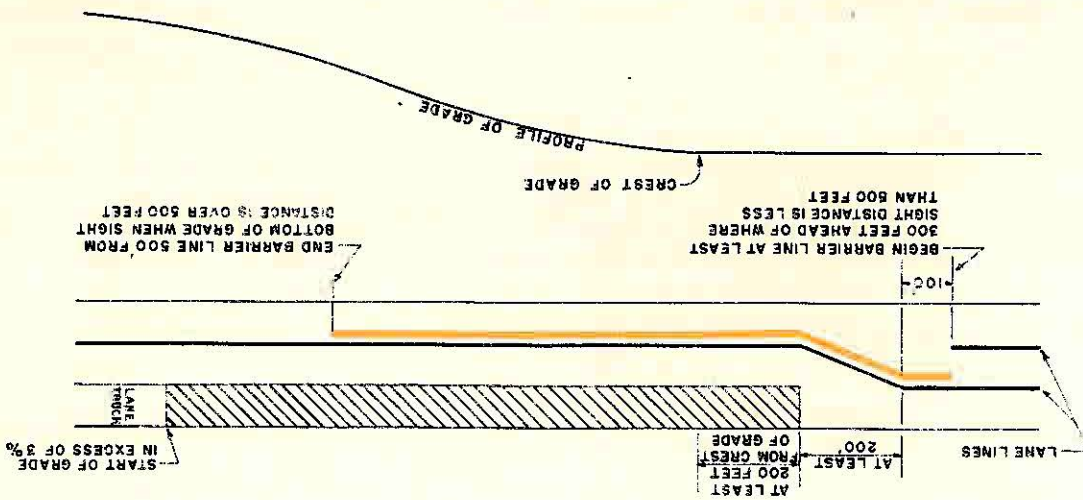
a - STANDARD PAVEMENT MARKINGS
